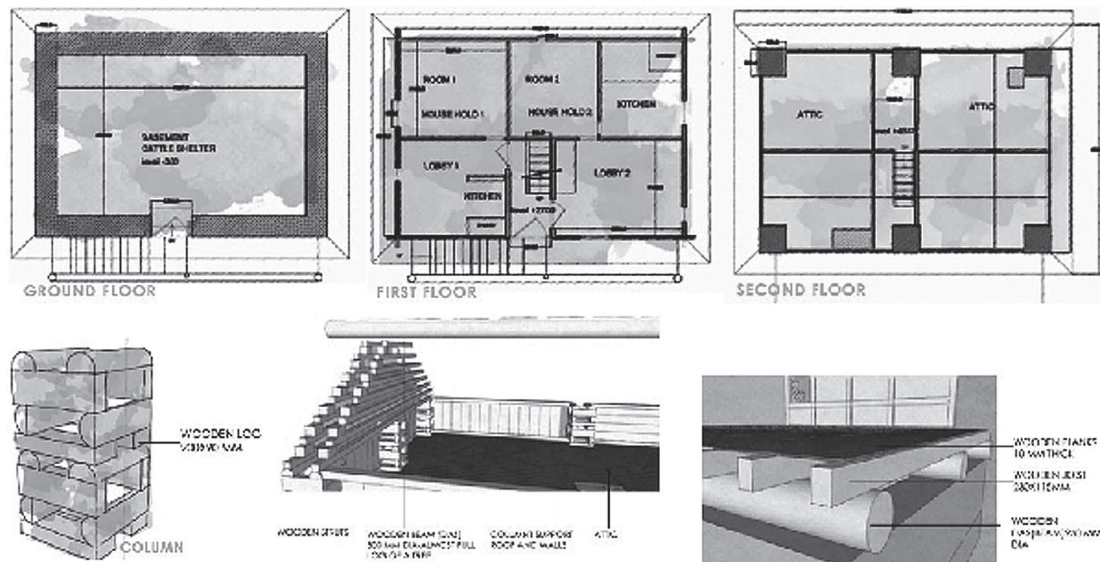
(Top, left to right) Floor plans with basement for cattle shelter, first floor for habitation and attic for food storage. (Bottom, left to right) Details of a typical column, roof, and flooring.
